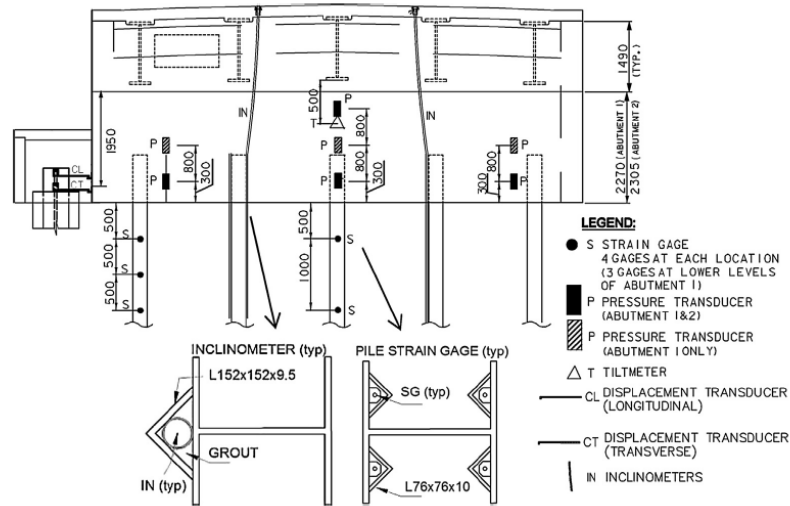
Middlesex bridge instrumentation plan (Civjan et al. 2013)
